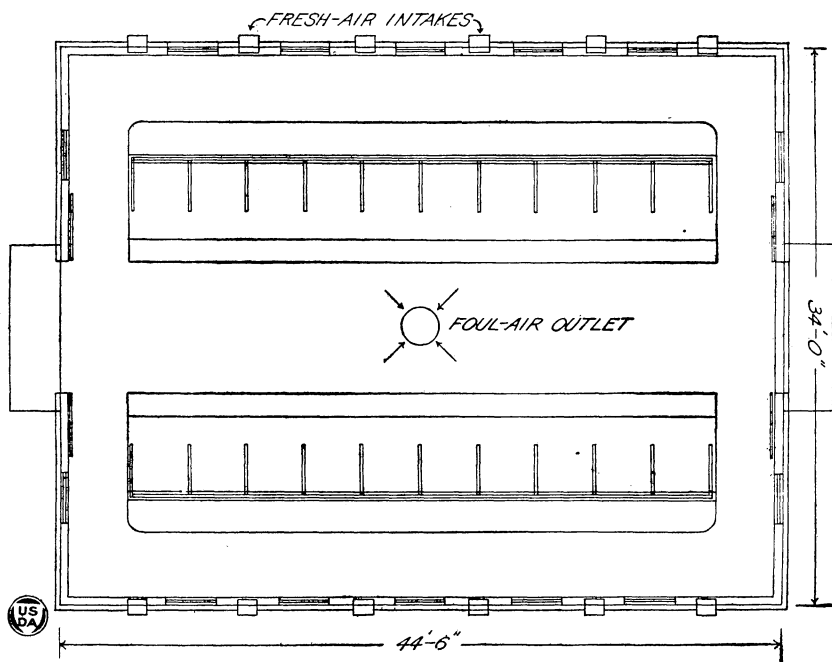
Plan of one-story cow stable, showing arrangement of ventilating flues.
